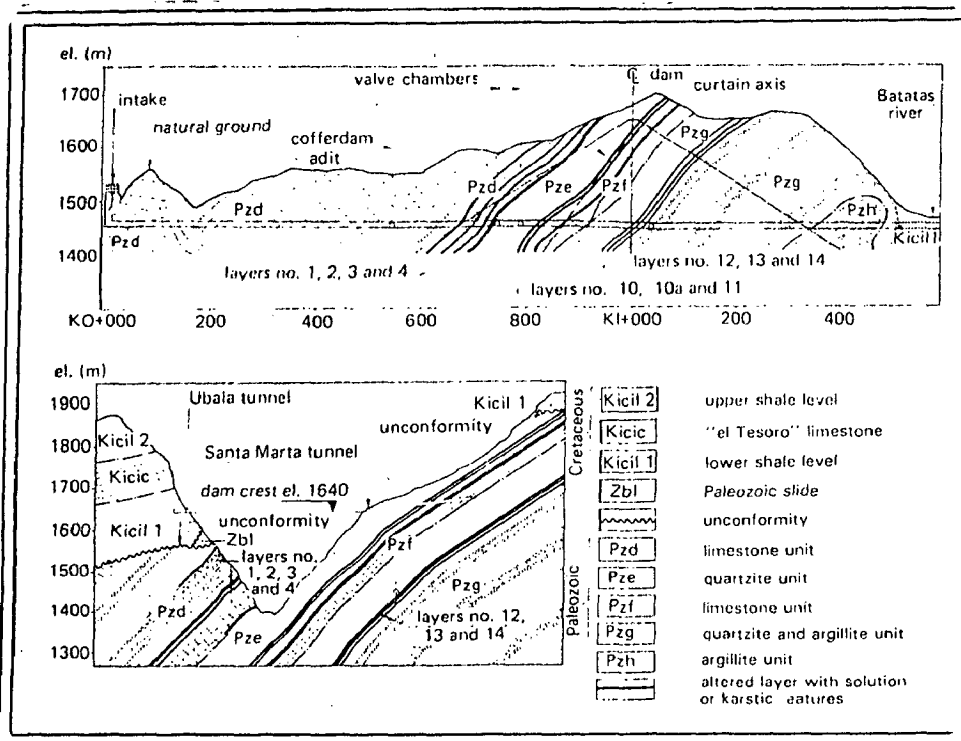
Foundation / Geology condition of the dam site, Guavio Dam.
